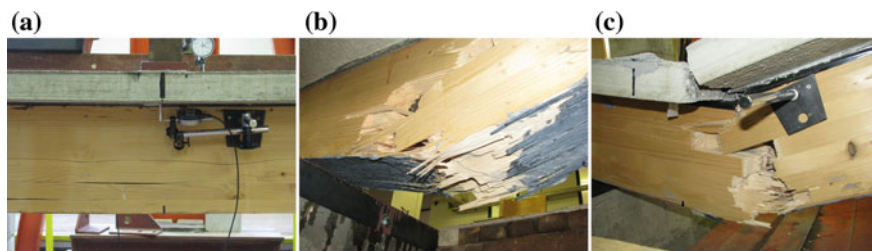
Tensile failure of the timber beam (a), failure of the CFRP reinforcement (b) and the total failure of the specimen (c)
